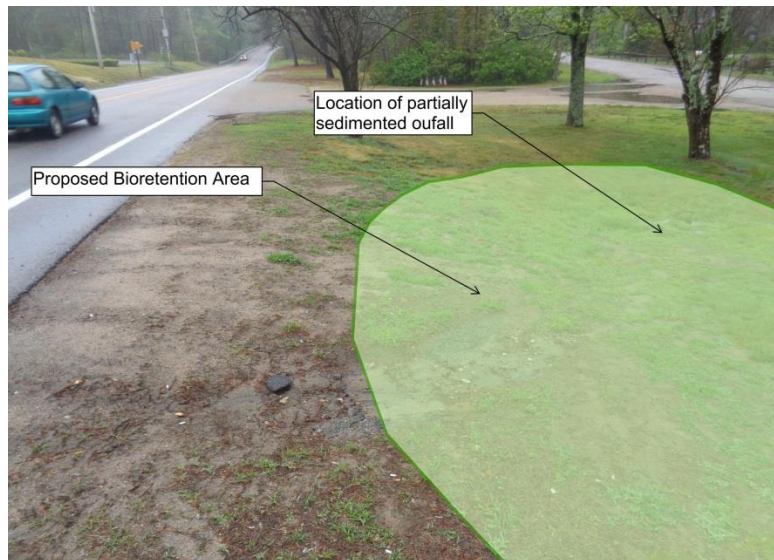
View of proposed location for bioretention area along Carolina Back Road in Charlestown, RI.
